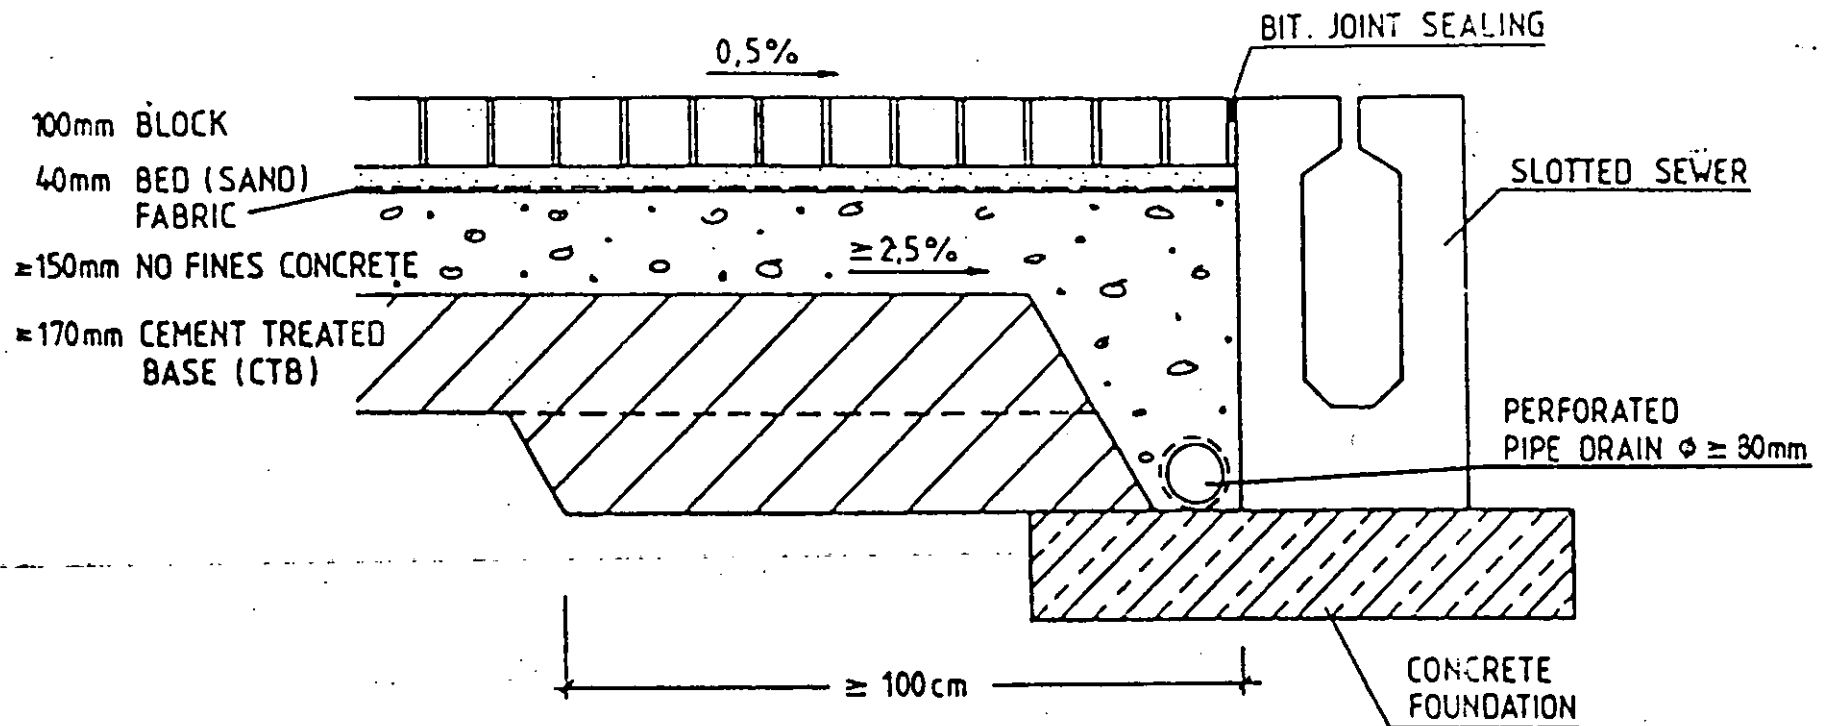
Heavy trafficked concrete block pavement structure with a base course of No-Fines-Concrete
